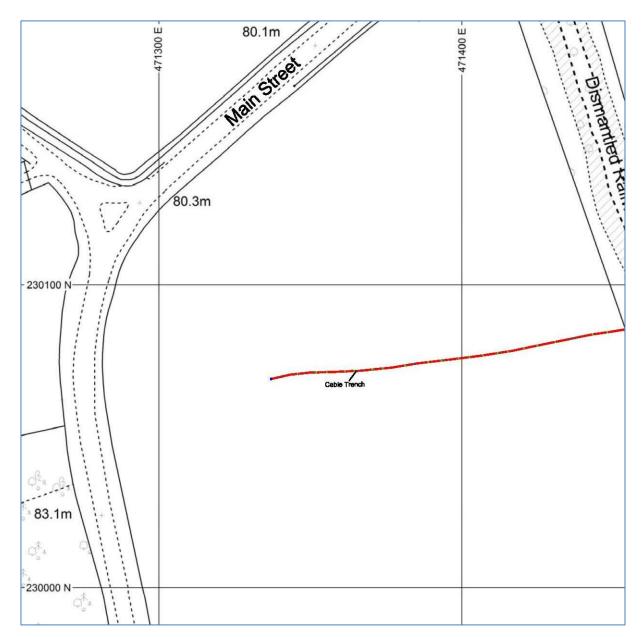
Site plan and cable trench location (*scale 1:1250*)
